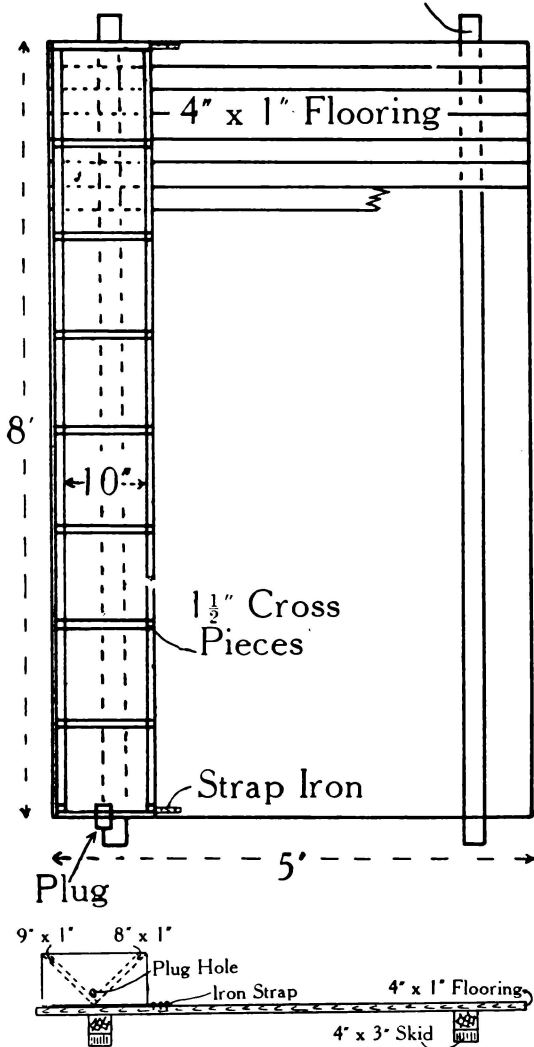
Showing plan and end view of wooden trough built on a movable platform. Movable equipment is most satisfactory for use in pig paddocks.
